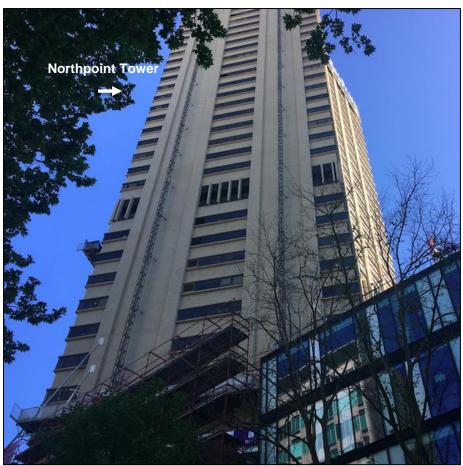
Northpoint Tower on the corner of Miller Street and the Pacific Highway
